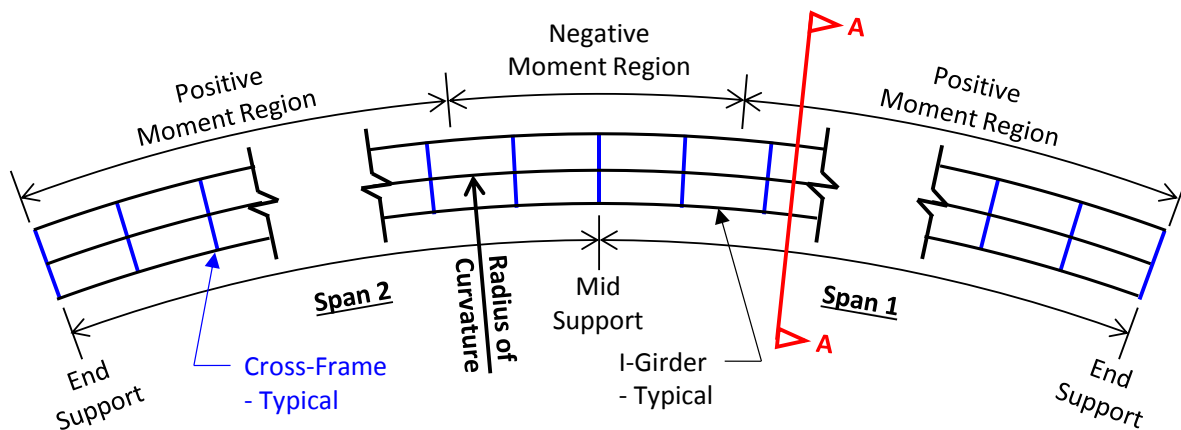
I-Girder Layout for Parametric Study – Plan View
